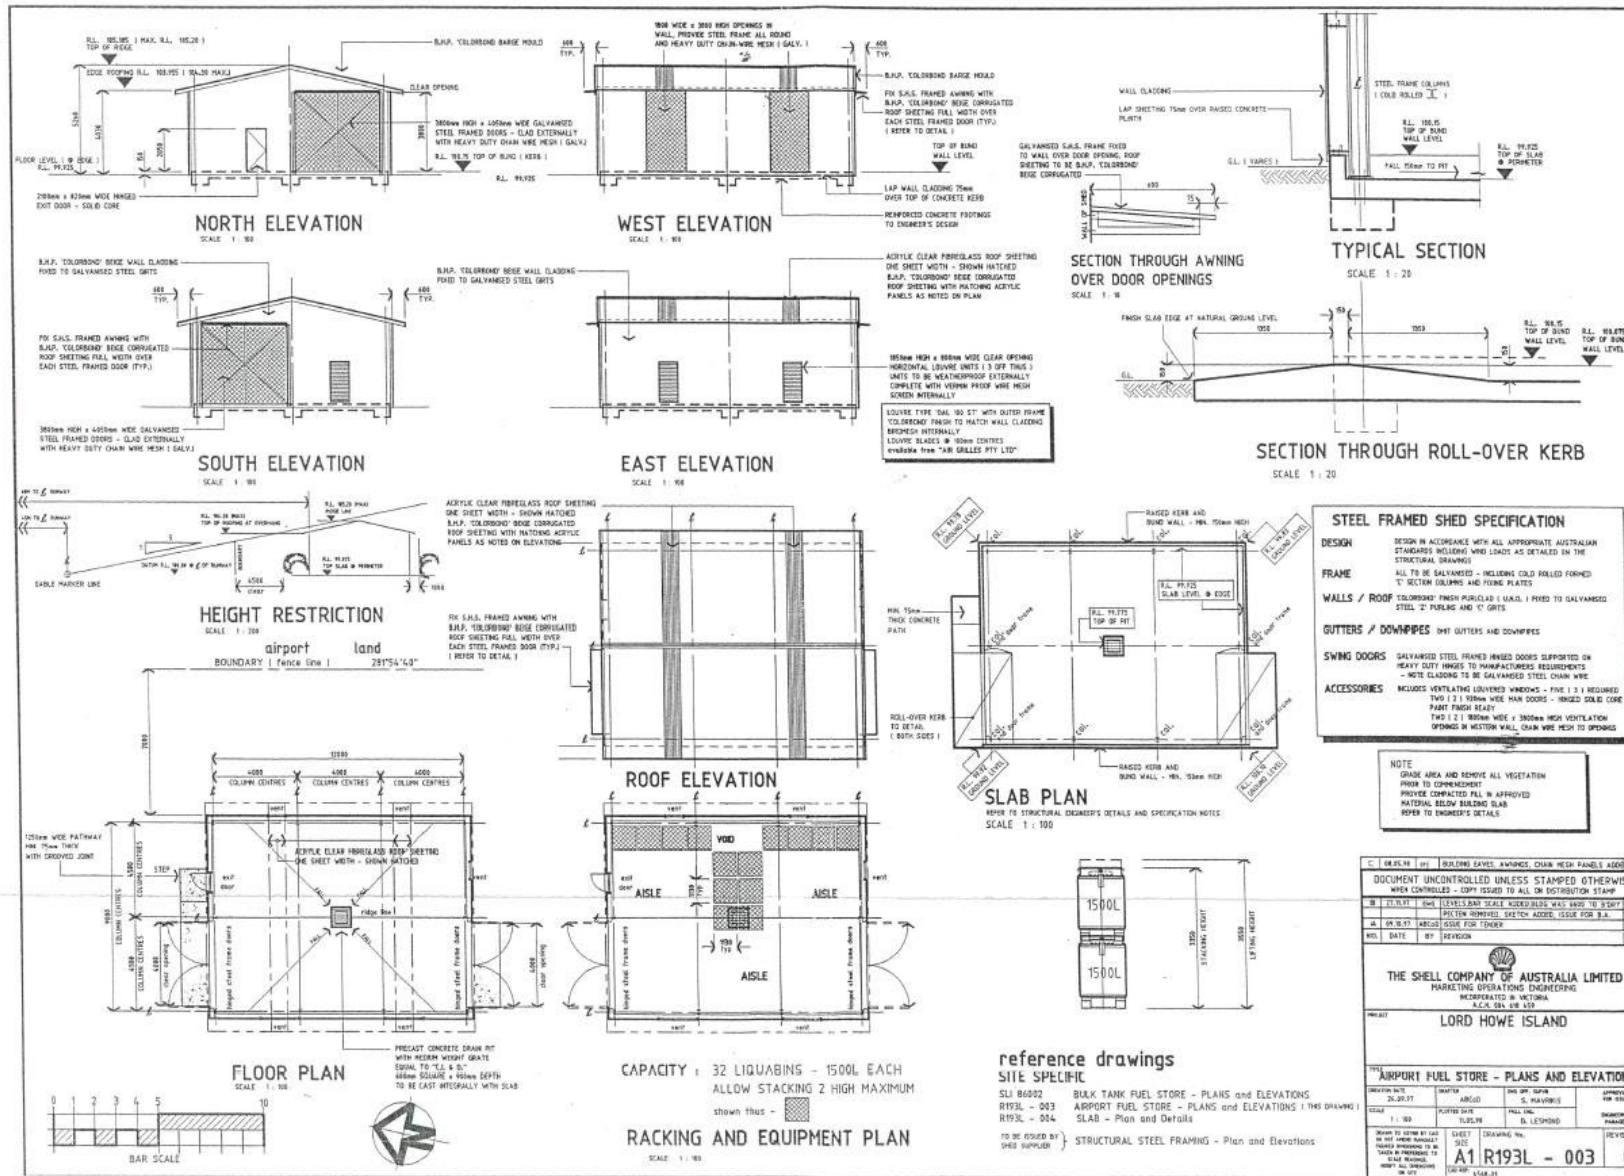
Applicant's submitted Slab and Floor Plans, Elevations, Sections and Steel Framed Shed Specifications
